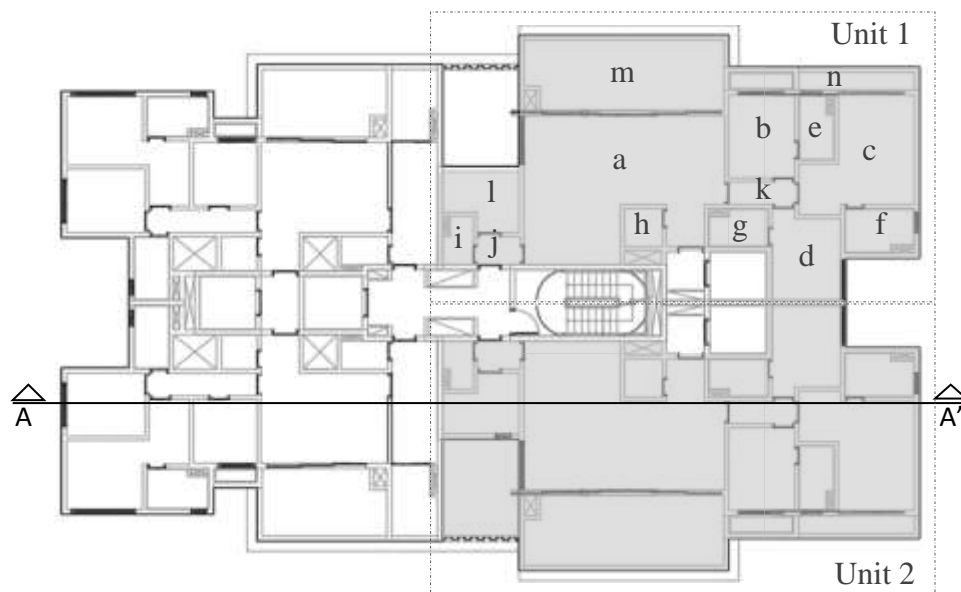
Floor type (15th floor): simulated housing units (1 and 2).
